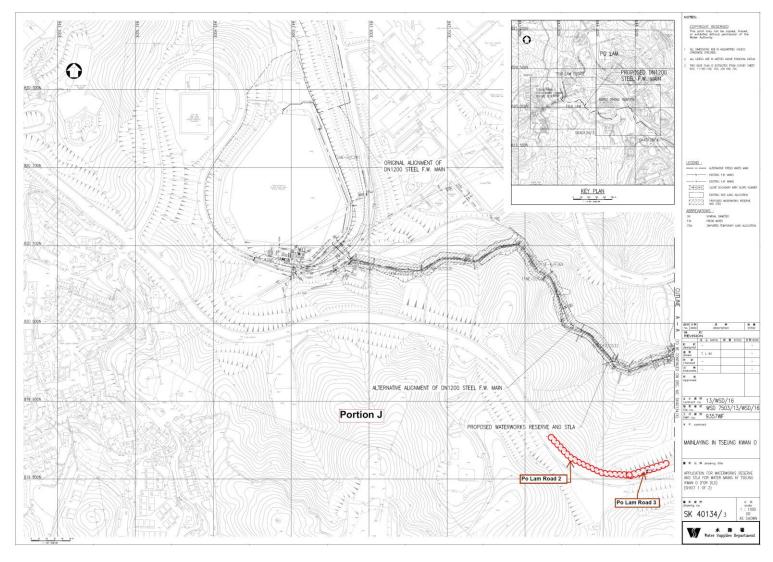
Location Plan for Portion J – Po Lam Road 2 (PLR 2) and Po Lam Road 3 (PLR 3)
